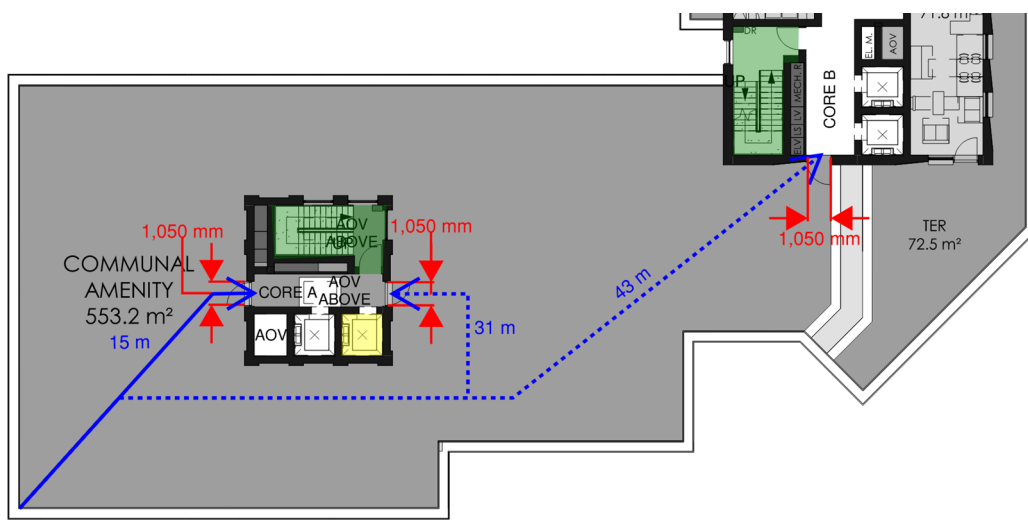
Communal roof terrace arrangement indicating stair cores in green, evacuation lift in yellow, travel distances in blue arrows and storey exit width measurements in red.
